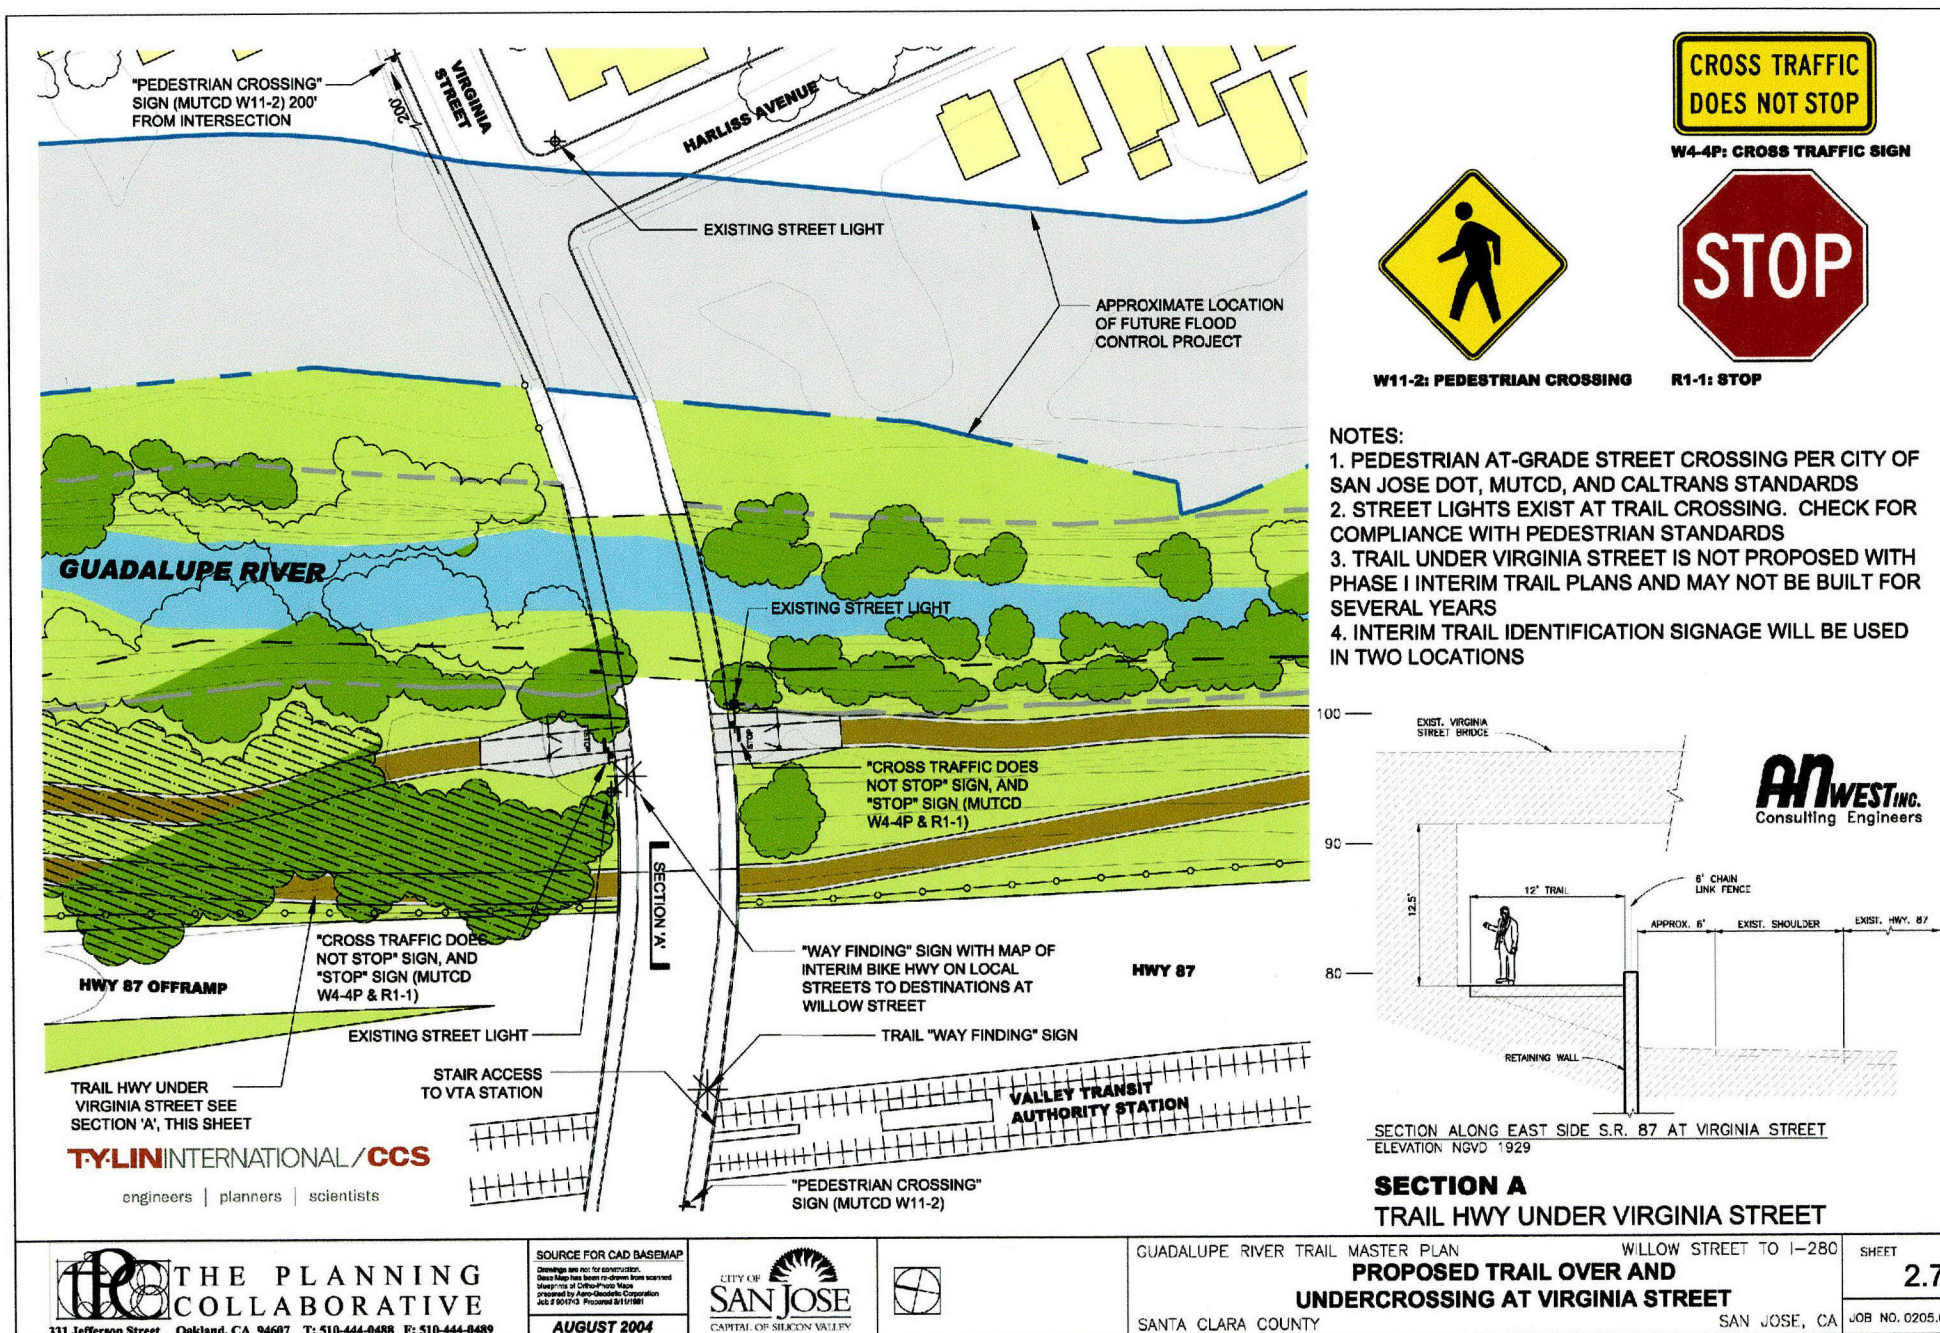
Proposed Trail At-Grade and Undercrossing at Virginia Street
